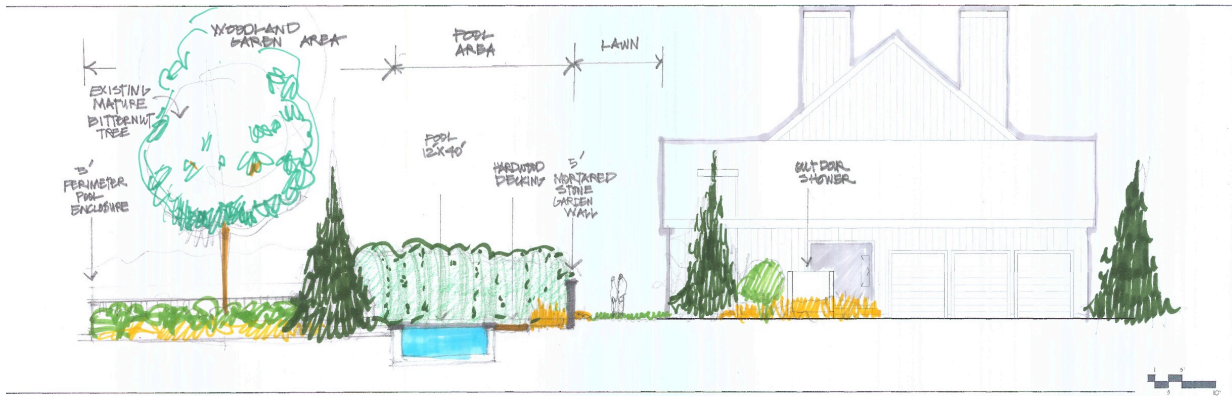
Landscape detail: North Elevation (source: John K. Szczepaniak, Landscape Architect)
